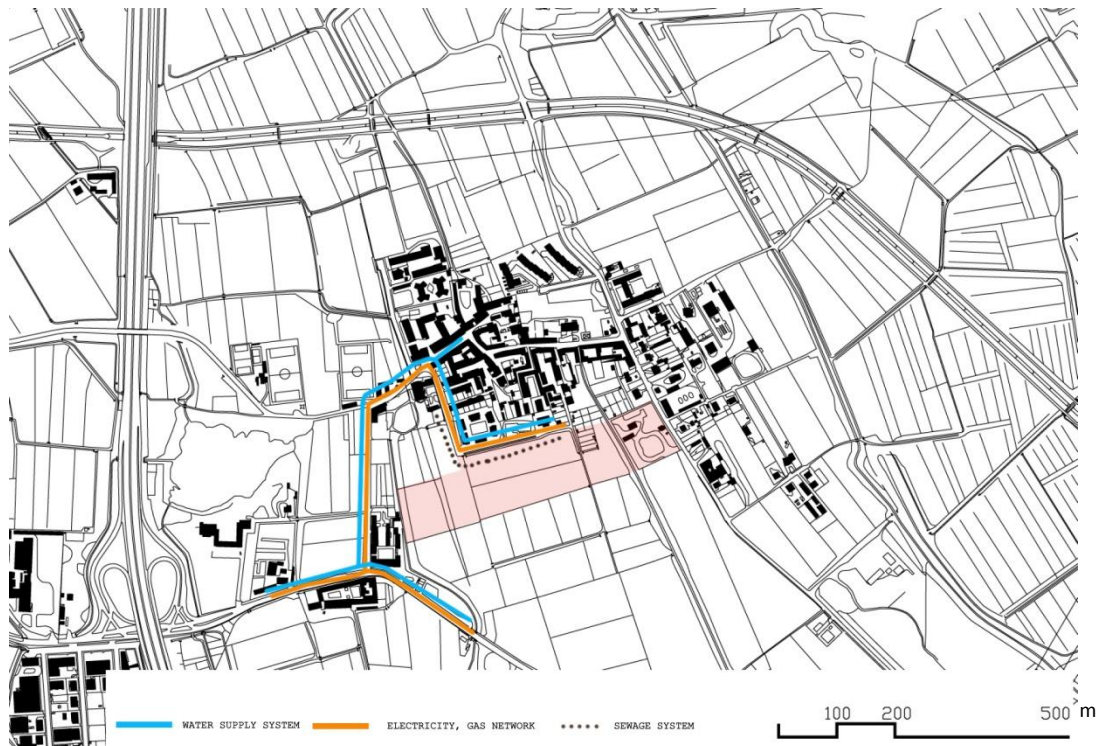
THE EXISTING UTILITY INFRASTRUCTURE PLAN
